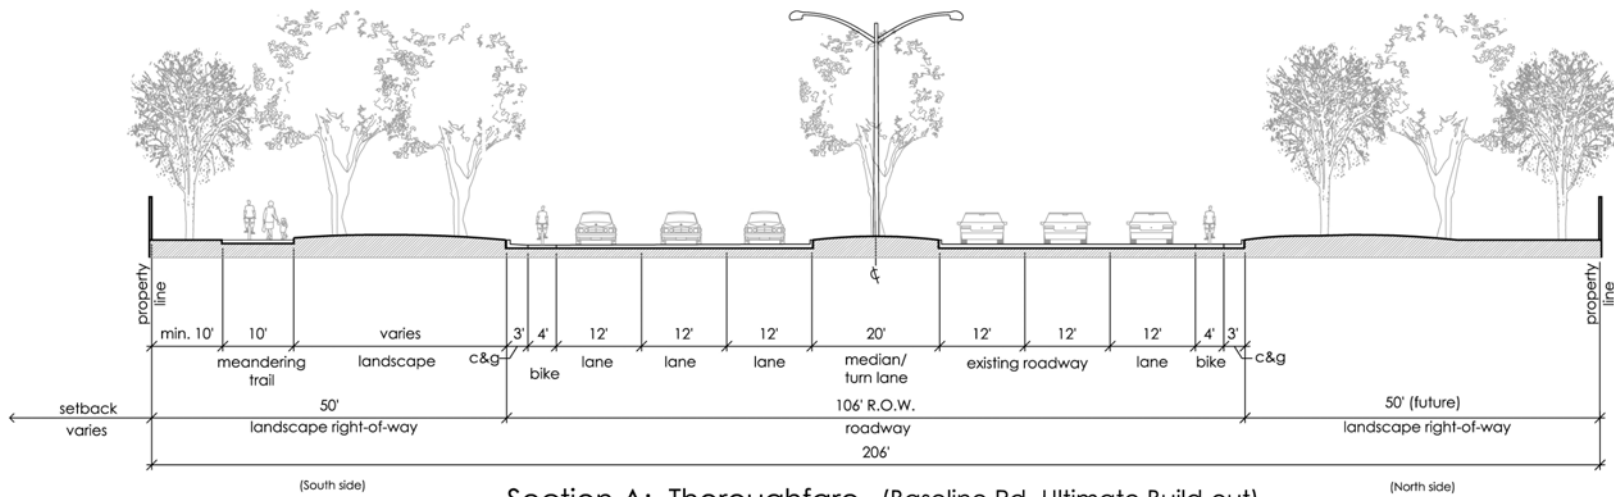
Roadway Sections—Thoroughfare (Base Line Road)
